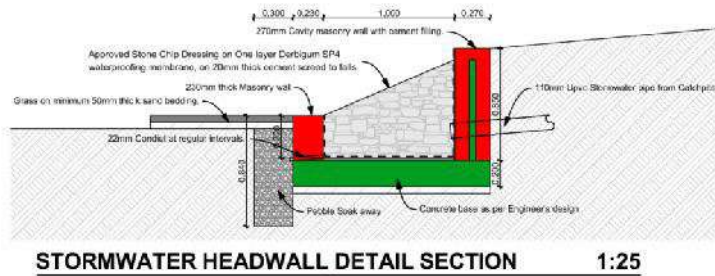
Detail of the proposed stormwater headwall (DEM TECH, 2020)
